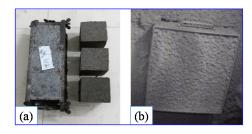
Casting concrete into steel molds (a); and spraying into a mold (b).
